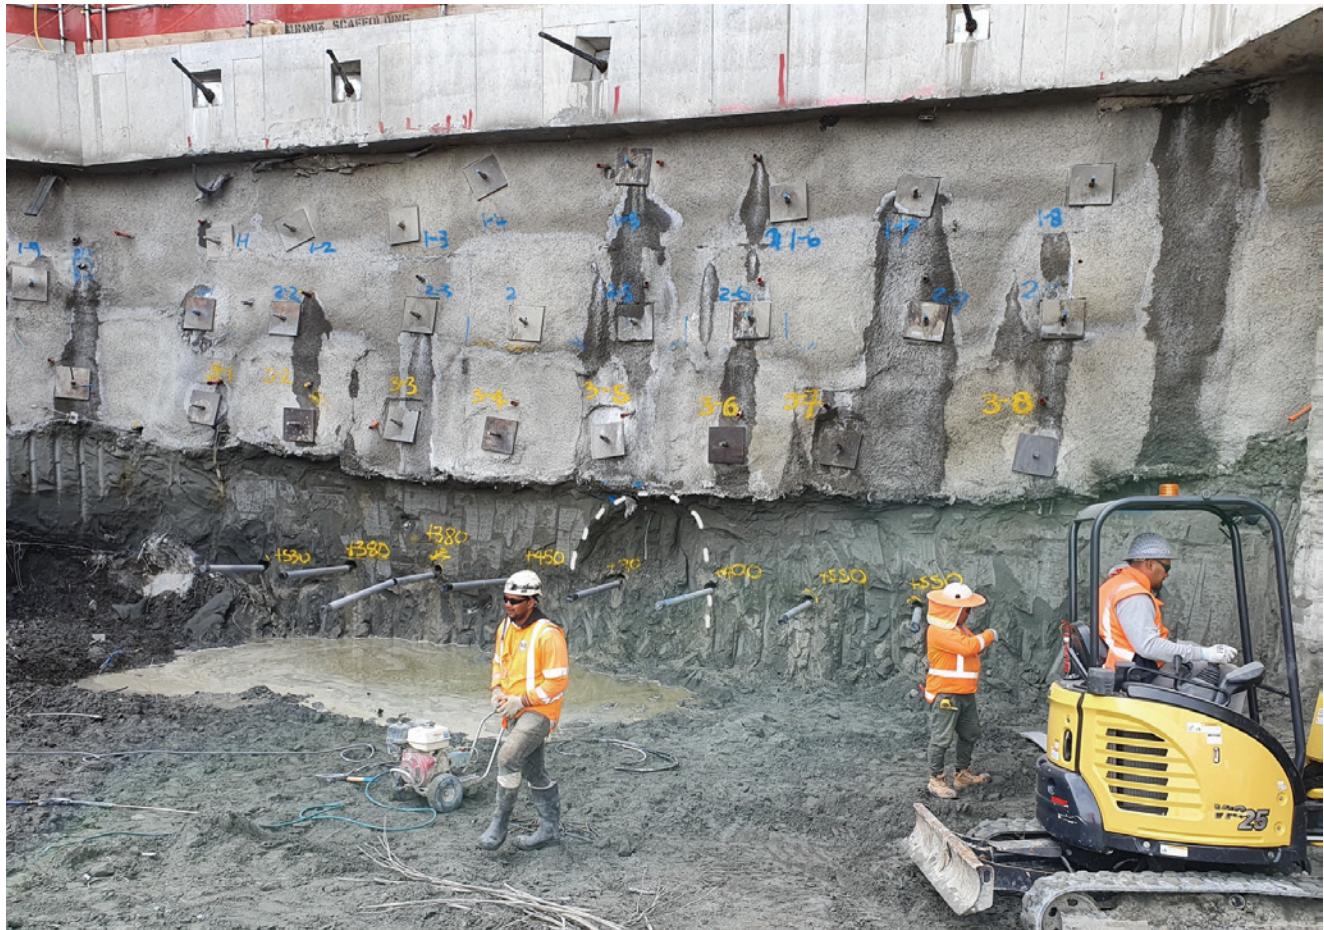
MC30/60 tunnel portal face during construction, uncemented sandstone (EUs1) present in face, note drop out failure highlighted with white dashed line, also note obliquely oriented anchors in waler beam above tunnel portal to avoid clashes with canopy tubes and spiles.
